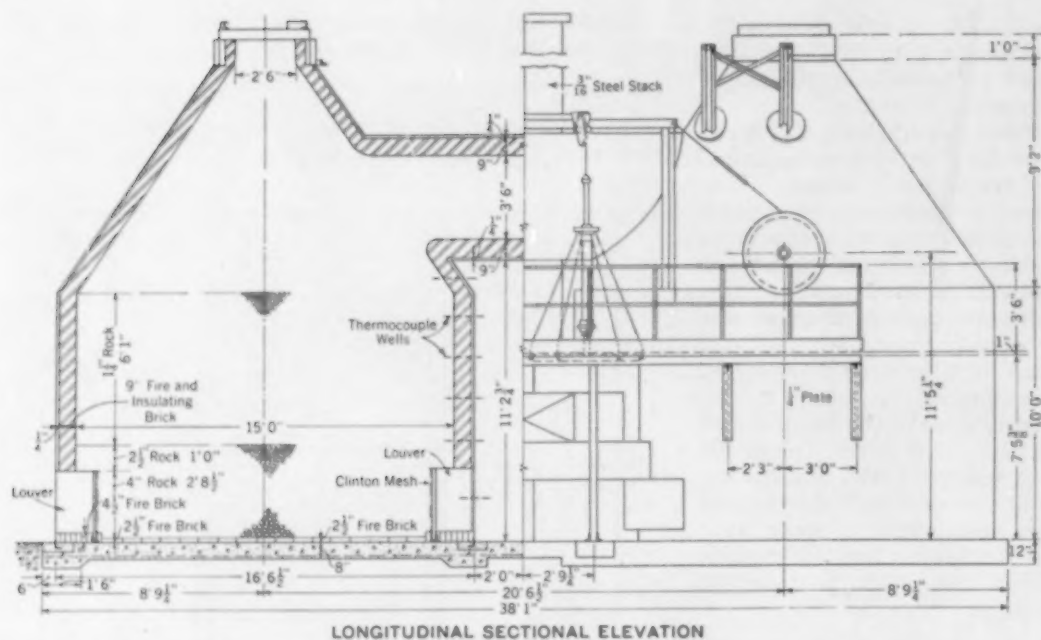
PROPOSED DE-STENCHER FOR PASADENA DISPOSAL PLANT
